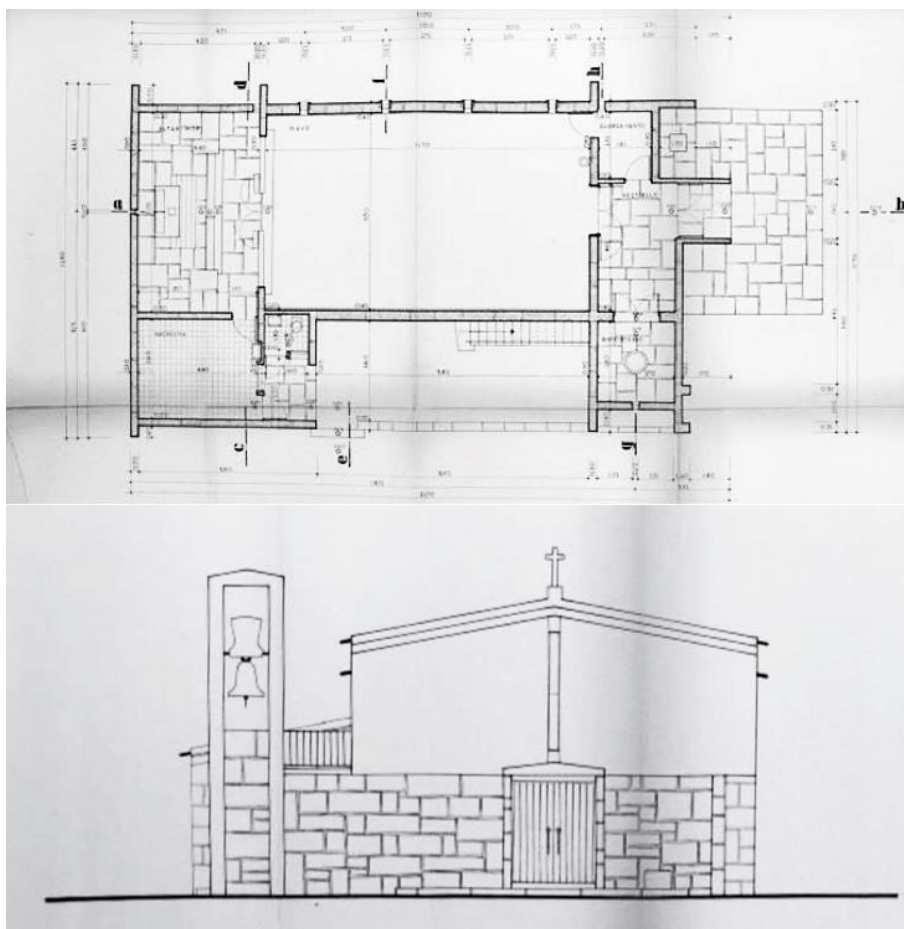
Elevation and plan of the Chapel. Project by architect António Trigo. Boalhosa Agricultural Colony. *Junta de Colonização Interna*, 1960
